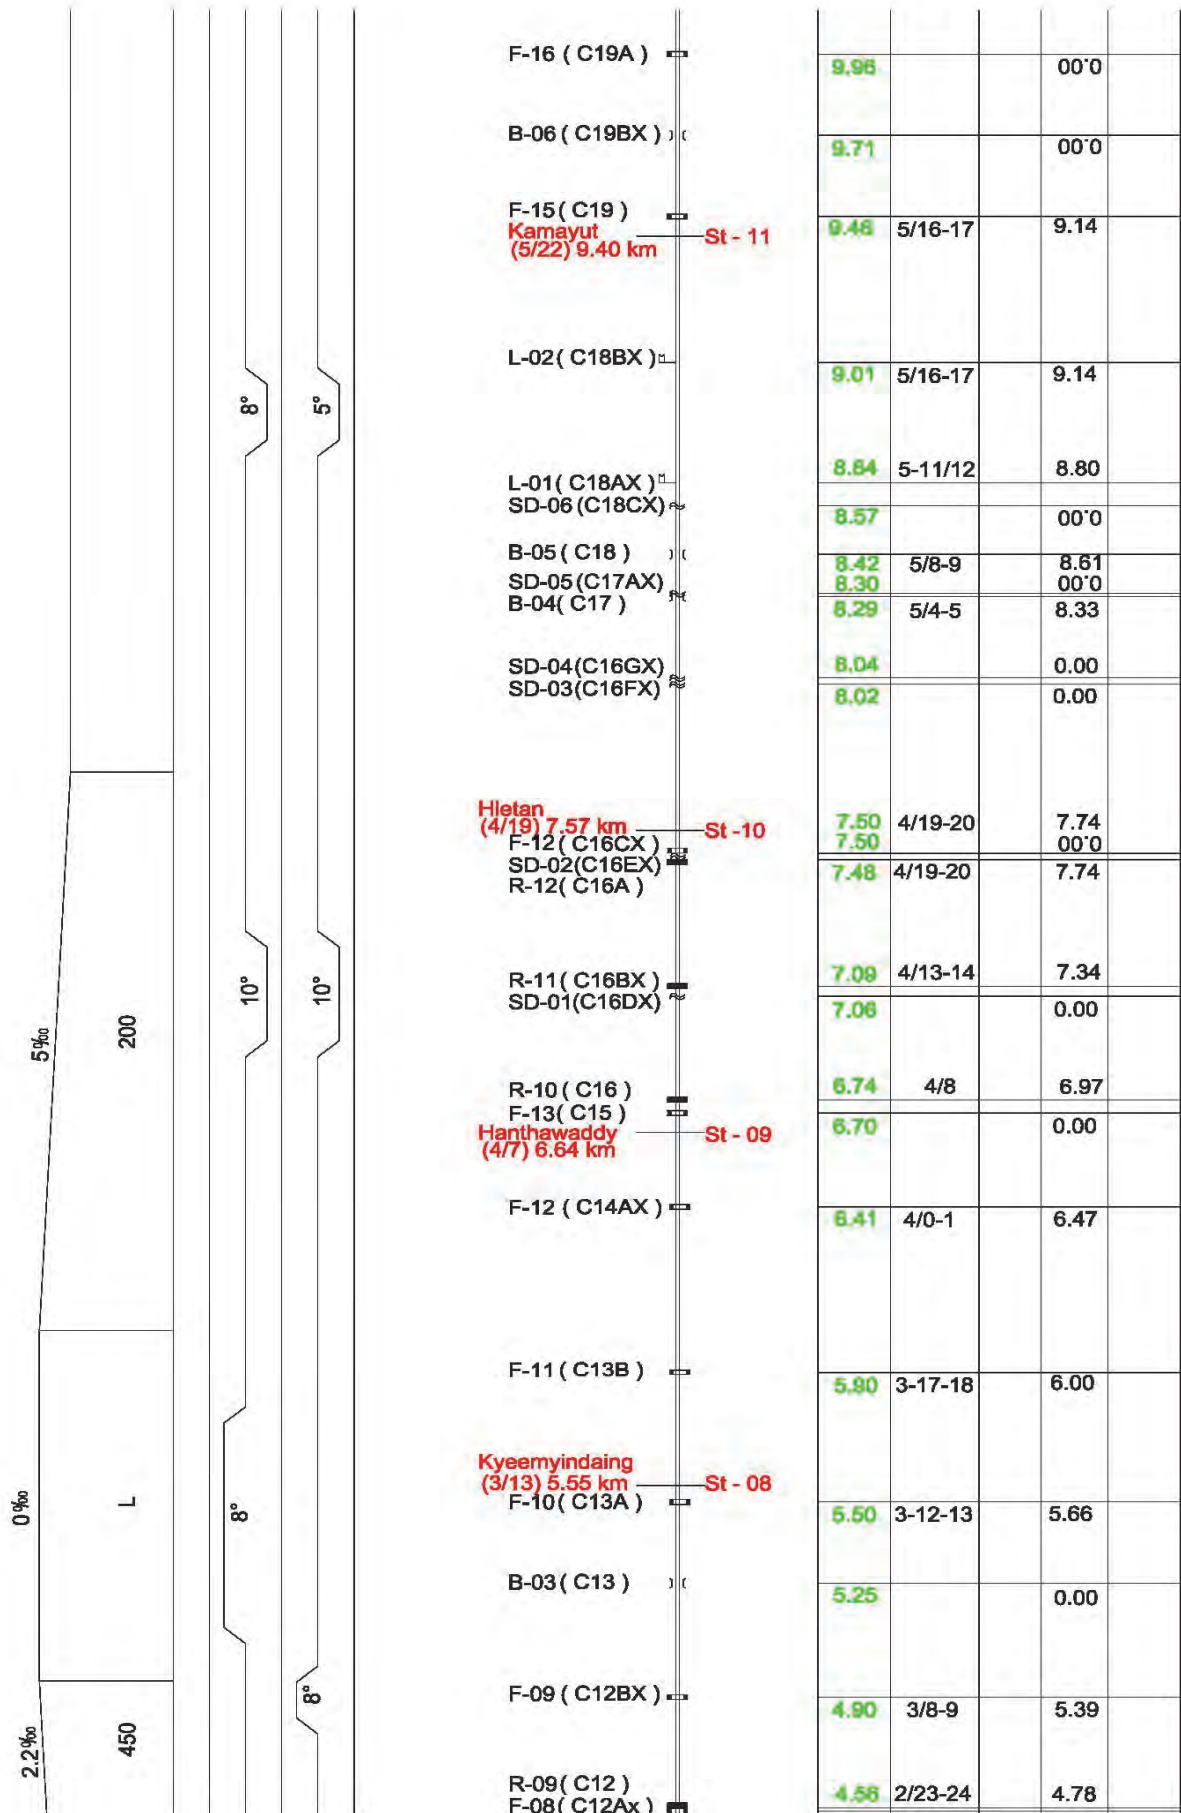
Schematic Sketch on Existing Yangon Circular Railway (2/9)
